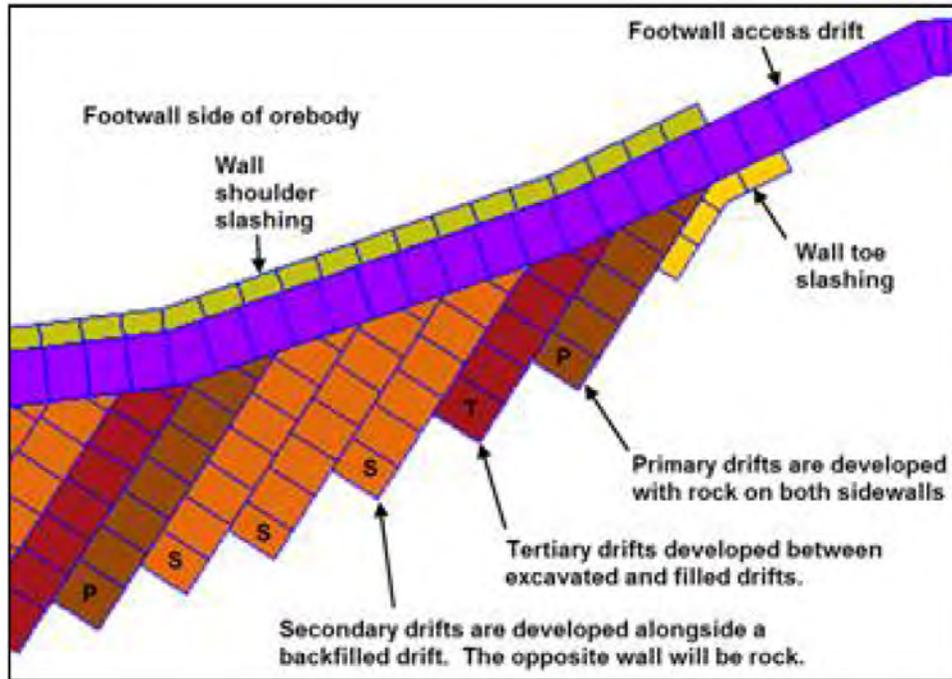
Drift and Fill Horizon Segment - Plan View
